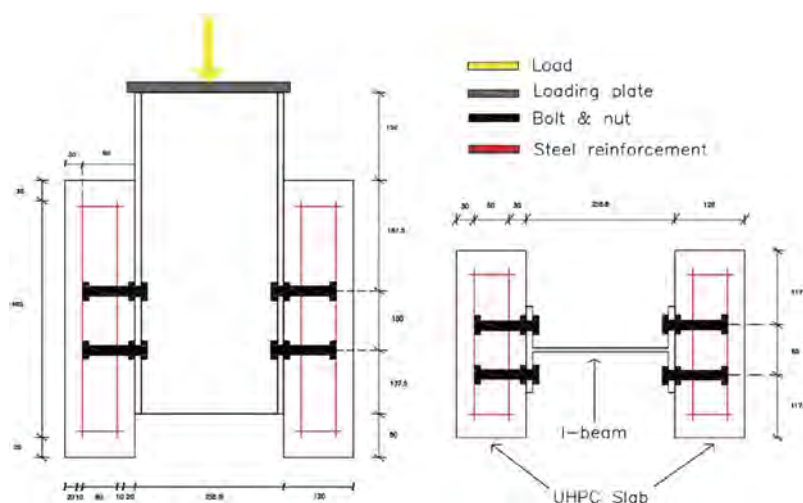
Dimensions in mm and details of the S-16-100-h90 specimen.
